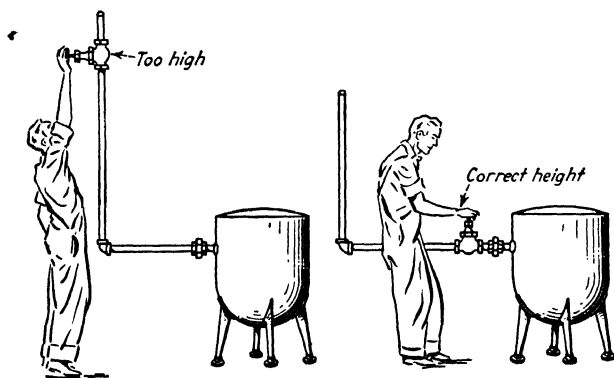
Locate valves where they can be operated easily. (Courtesy of Crane Co.)
